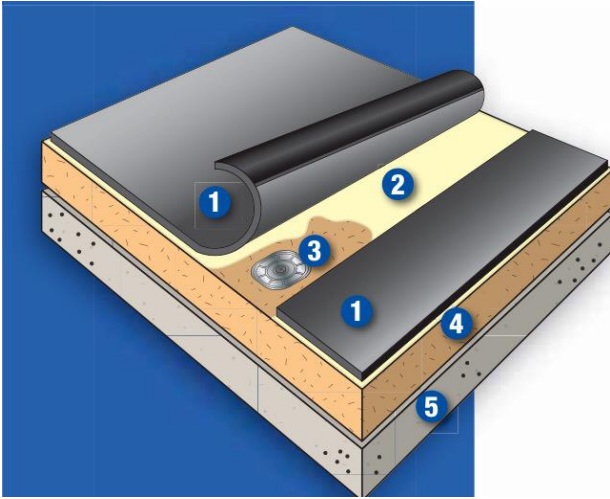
Diagram of a fully-adhered EPDM roof system showing (1) EPDM membrane, (2) bonding adhesive, (3) fastener plates, (4) insulation, and (5) roof deck. The tape on the top piece of membrane will create the seam over the bottom membrane.
